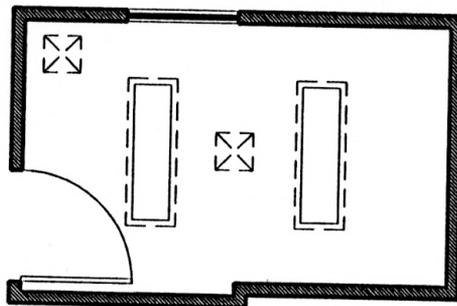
Plan of Assisted Living Work Area - Site 1.
